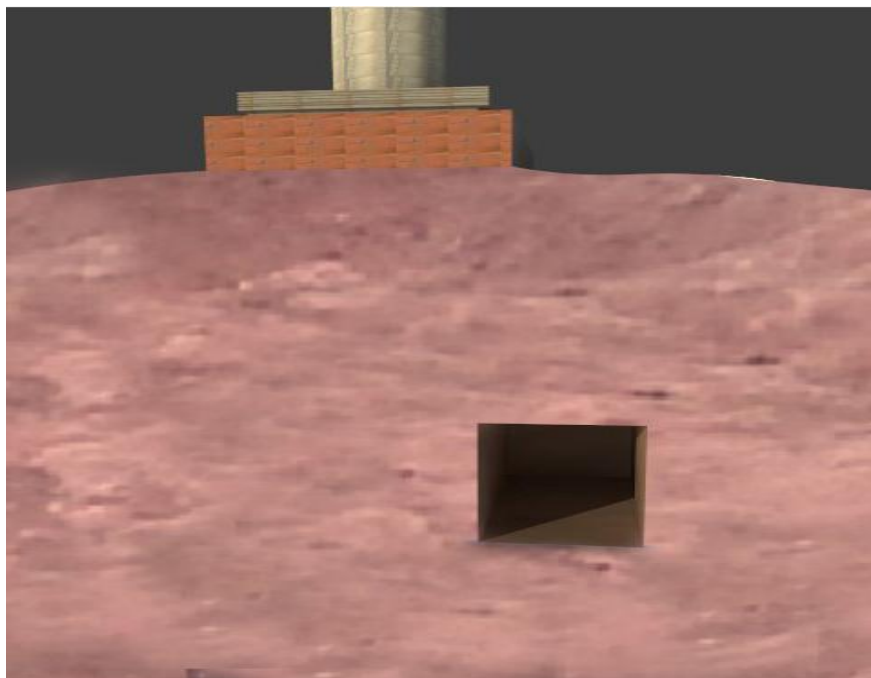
Section view of the underground tunnel at Bete- Abalibanos (ARCHICAD drawing)
